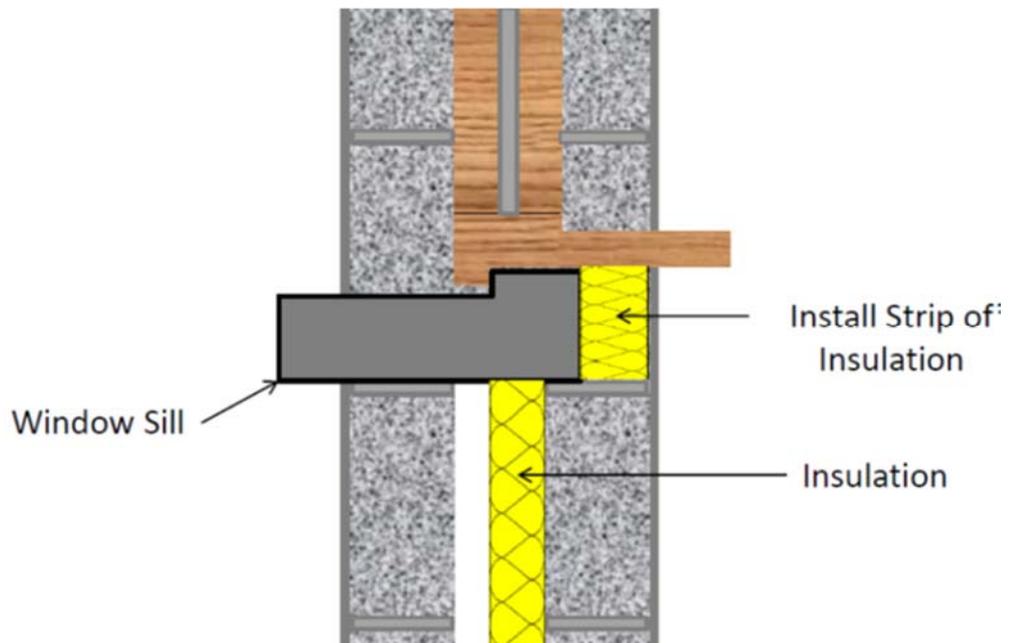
Cavity Wall with Insulation to Back of Sill with reduced Thermal Bridging
